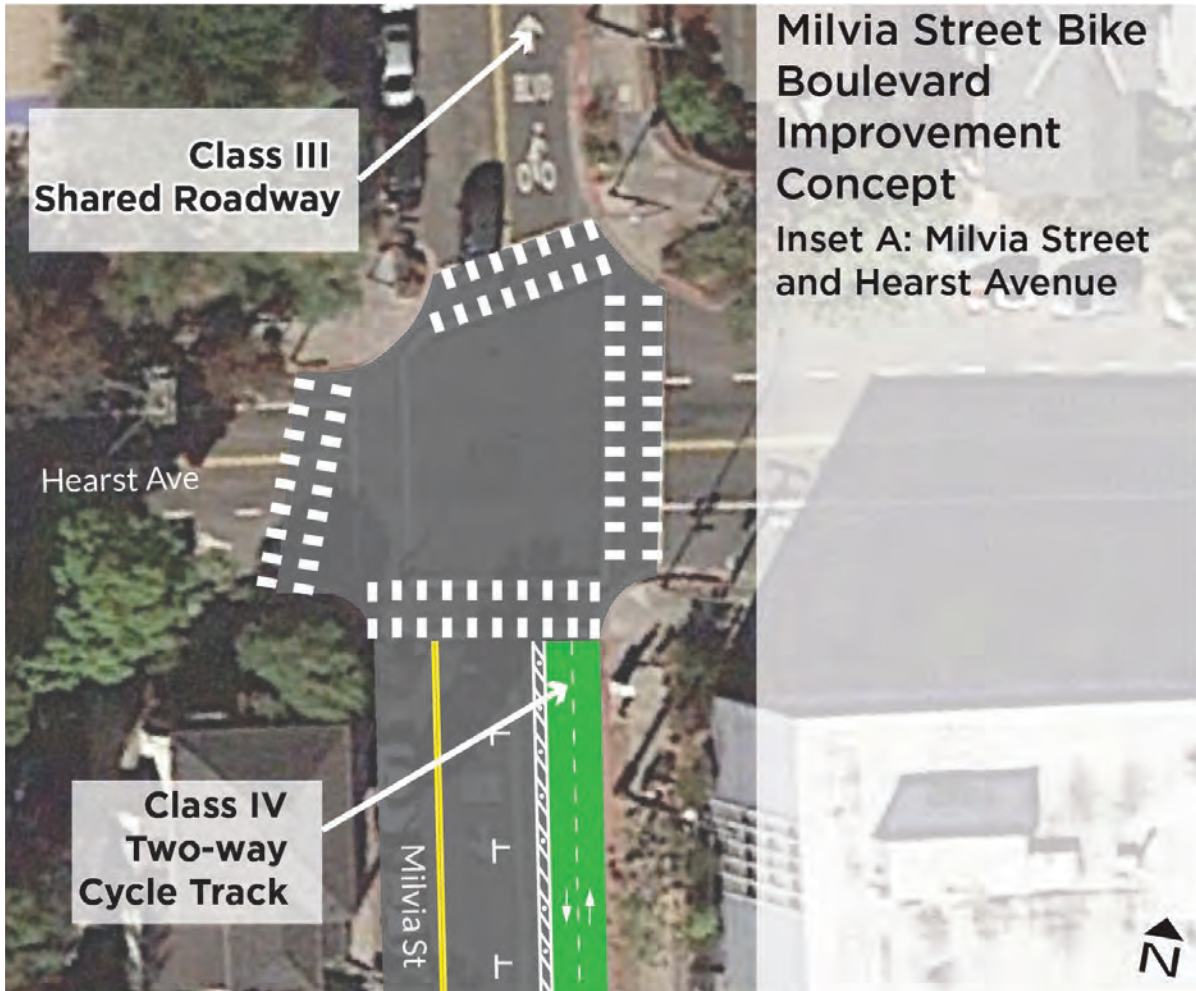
Milvia Street at Hearst Avenue Recommendations
